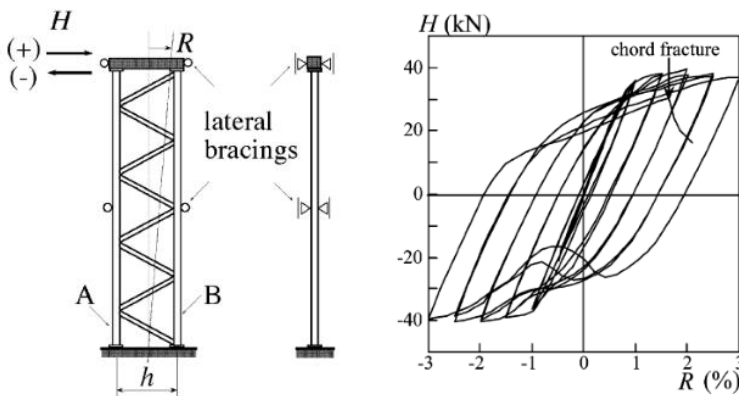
CFT truss specimen subjected to cyclically repeated horizontal loads (Kawano & Matsui, 2003)
